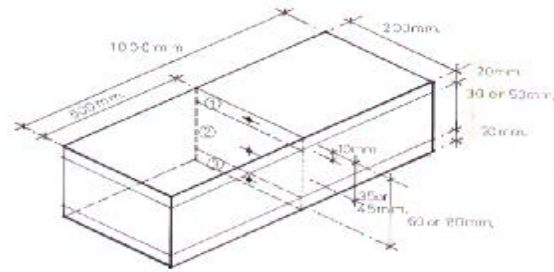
Thermocouples positions through the mid – span section of the concrete sandwich panel
